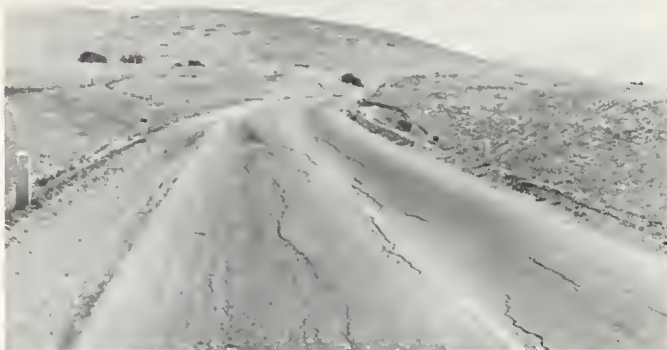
Center cracking in pavement in filled area, Highway 466.
